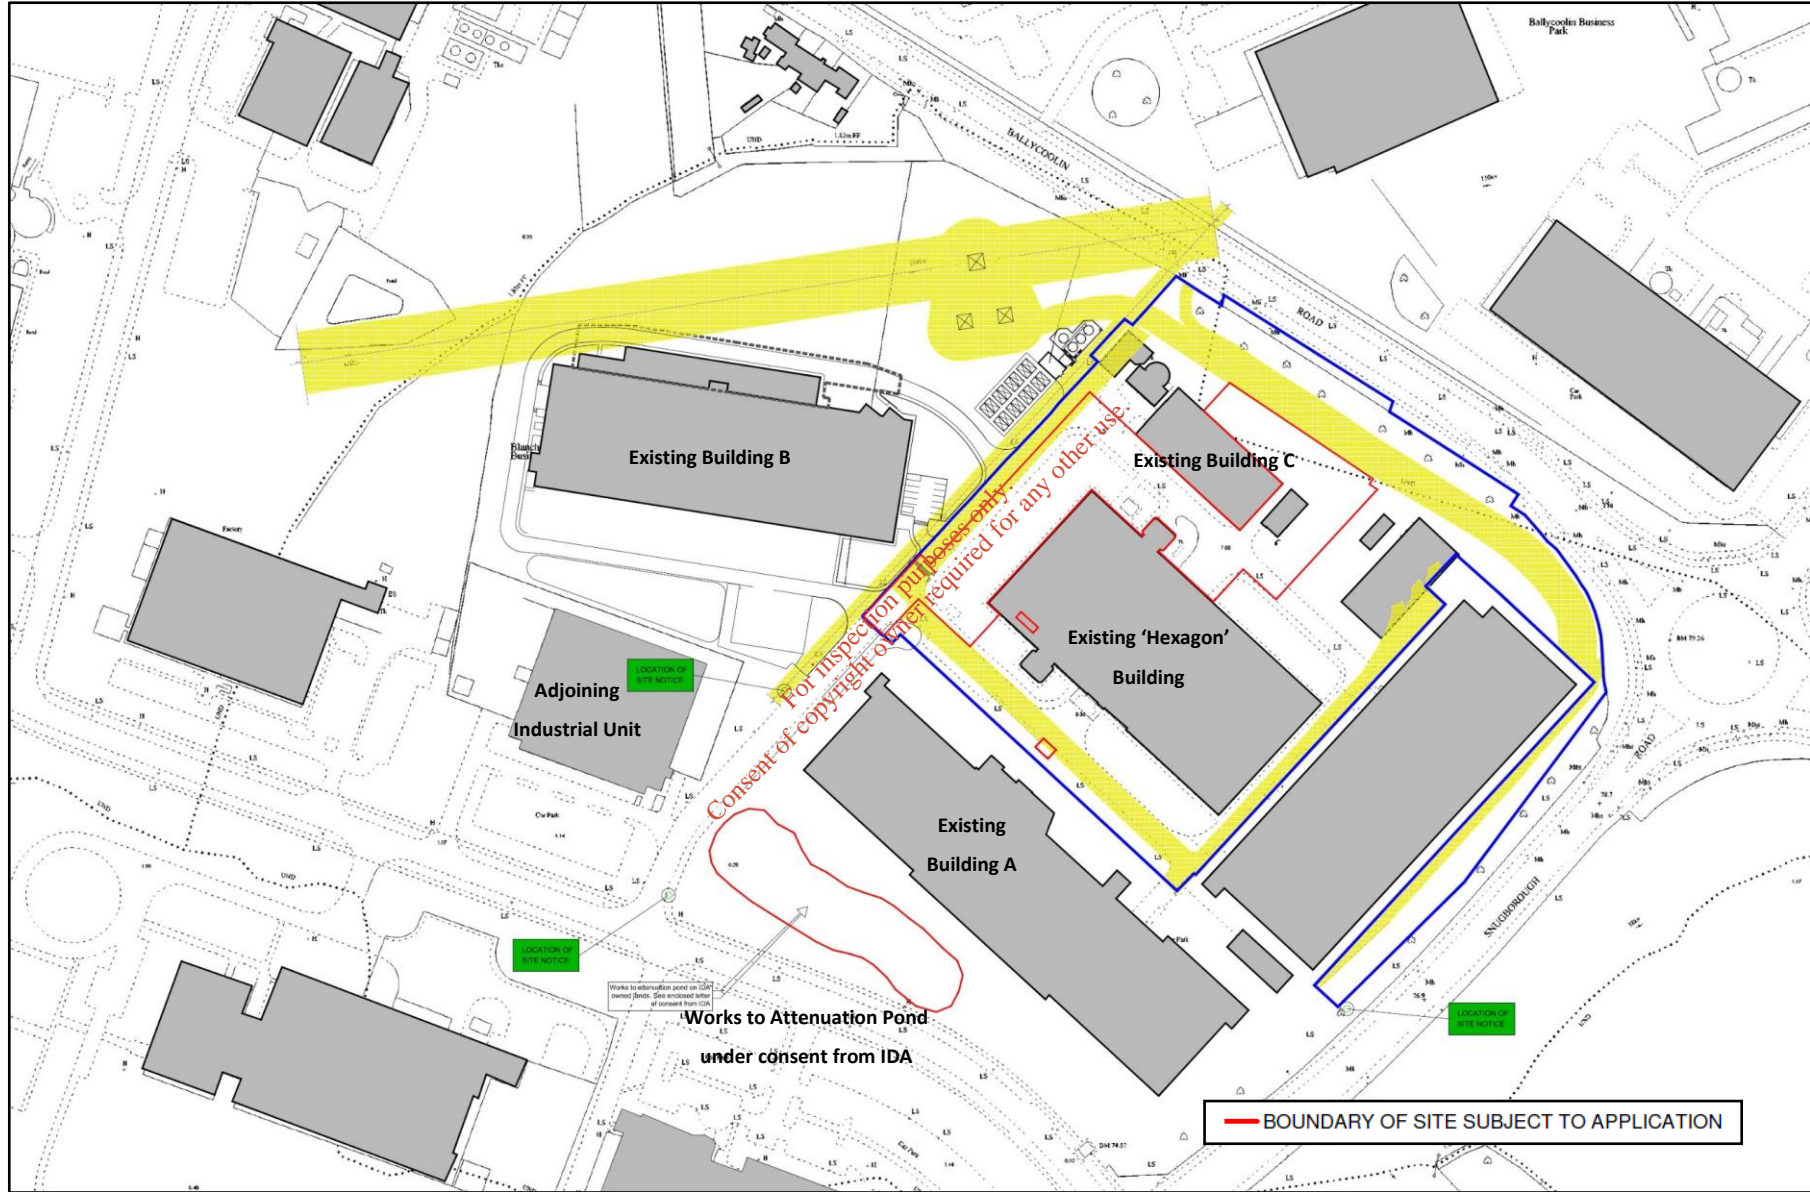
Site plan showing locations of proposed development in relation to the adjoining and neighbouring buildings
